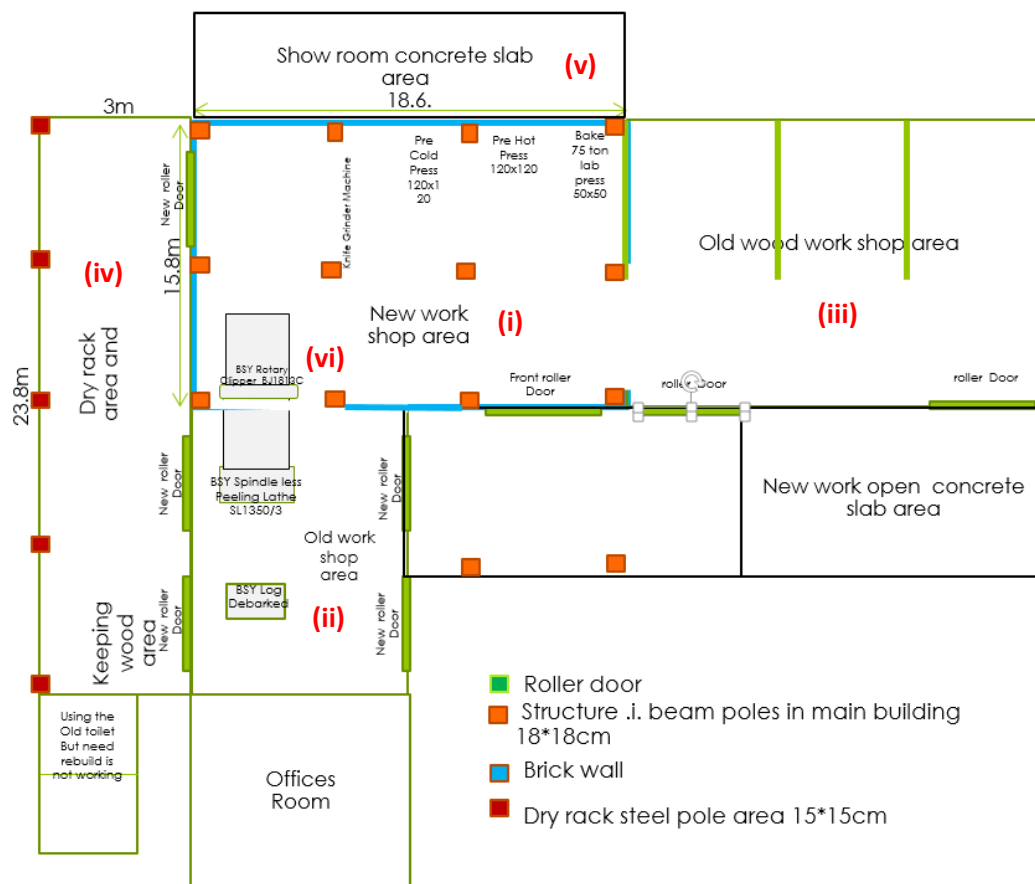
Floor plan for new work shop area (i), joining the VALTIP 2 veneer-processing (ii) and original dry-mill workshops (iii). The plan also includes a covered veneer drying area (iv), and product showroom (v). Note the removal of VALTIP 2 workshop wall (vi) to adjoin the new workshop.
